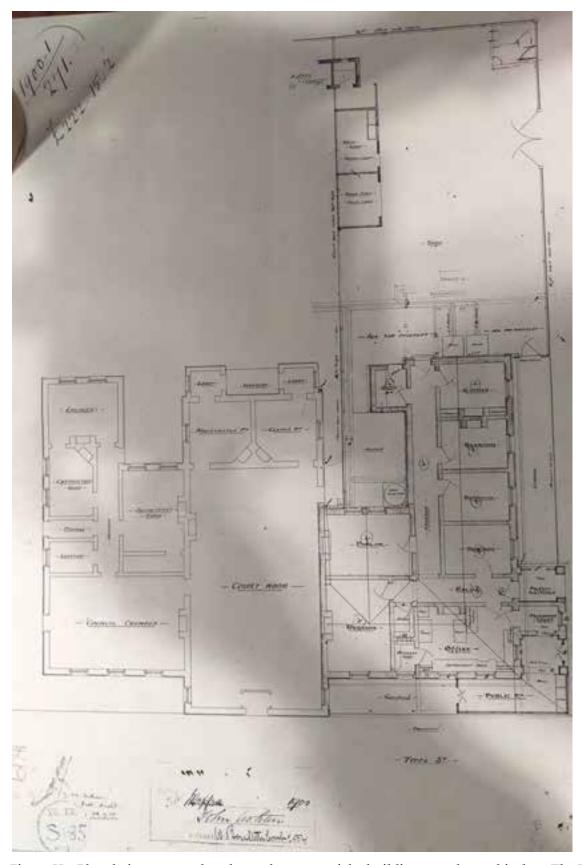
Plan dating to 1900 that shows the extent of the building complex at this date. The Tyers Street elevation of the post office retained the verandah and public room at this date (Saleta 2016).
